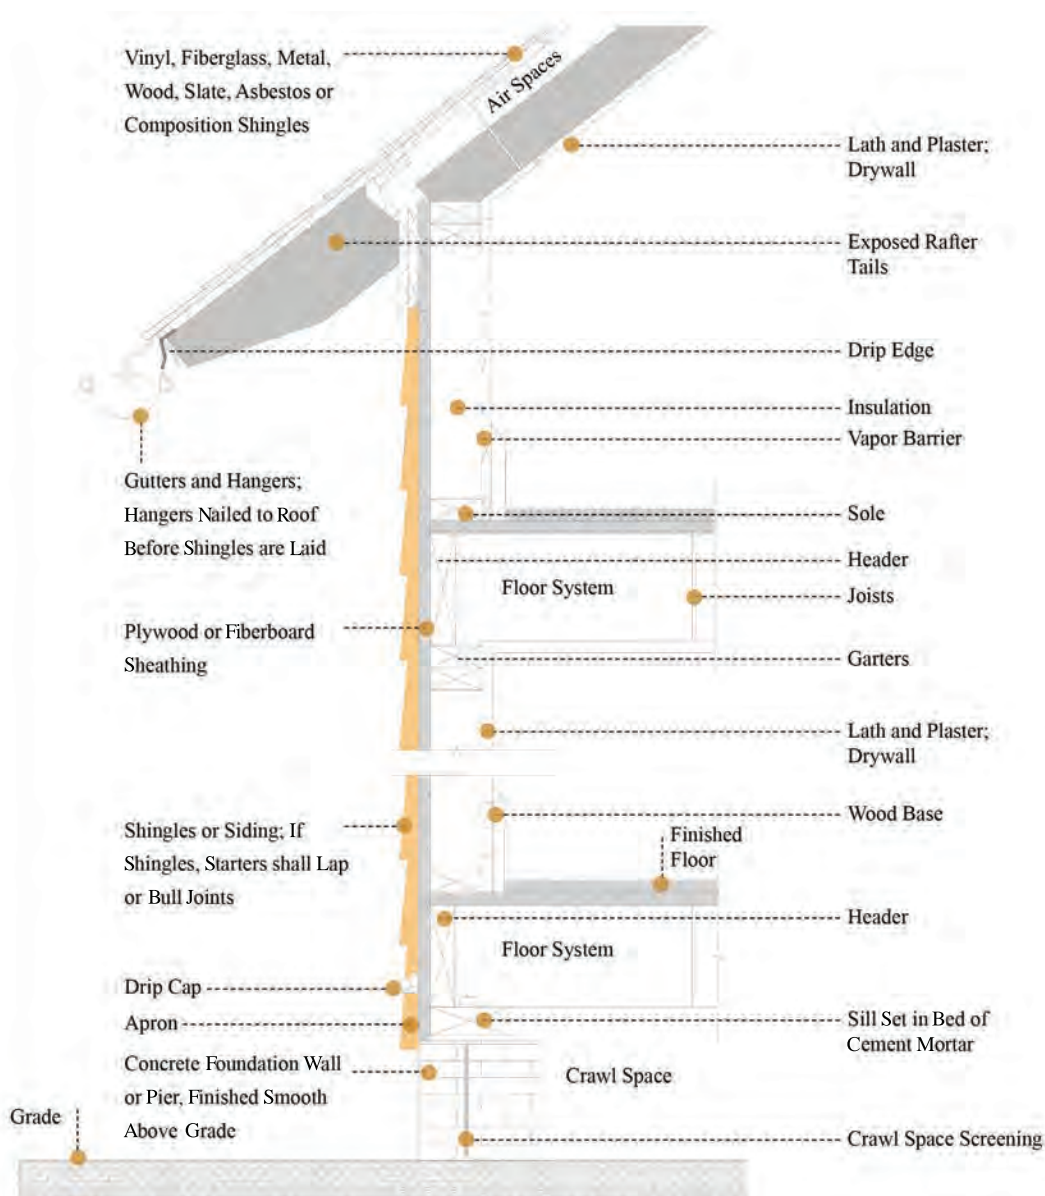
Partial Wall Section for Shingle Siding Construction; shows a drip cap and apron in place to protect the bottom edge of siding shingles.
